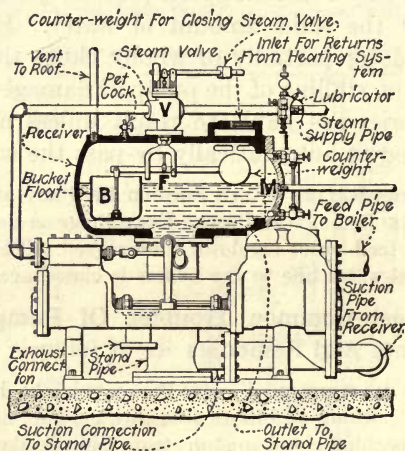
Duplex Steam Pump And Receiver Arranged For Automatic Return, To Boiler, Of Condensate From Heating Apparatus.
